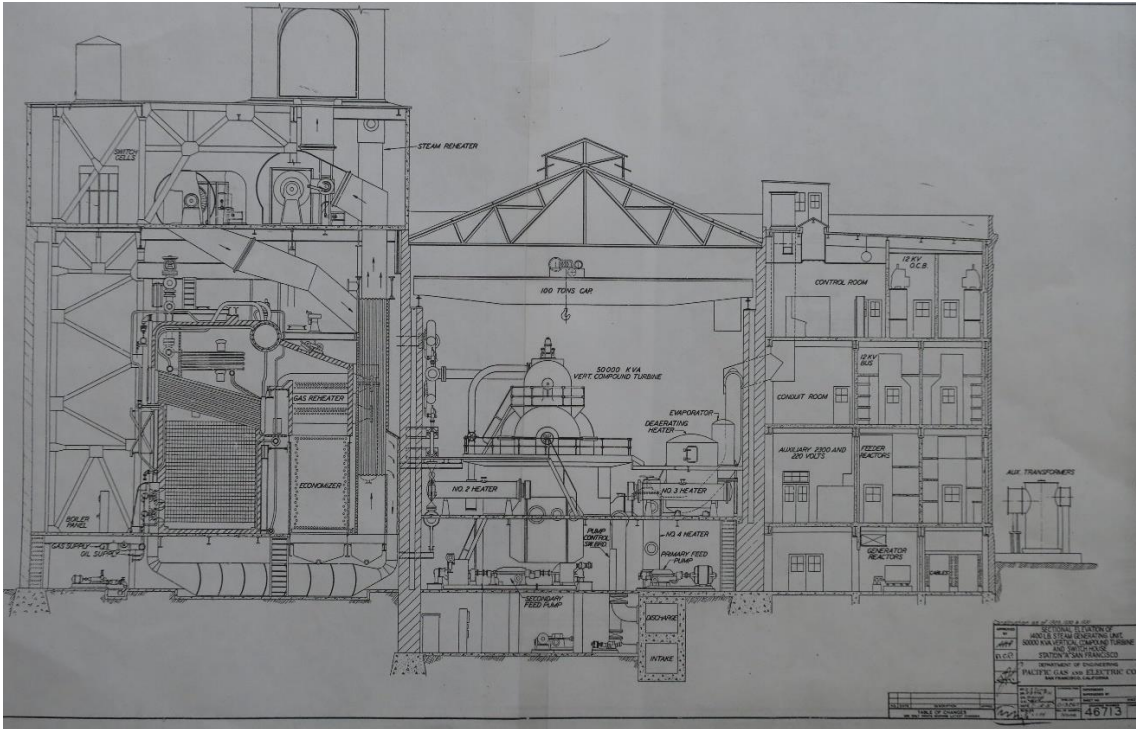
Sectional (north) elevation of Station A showing (from left to right): Boiler Hall, Turbine Hall, and Switching Center. Drawing by PG&E Engineering Department. Source: Associate Capital.
